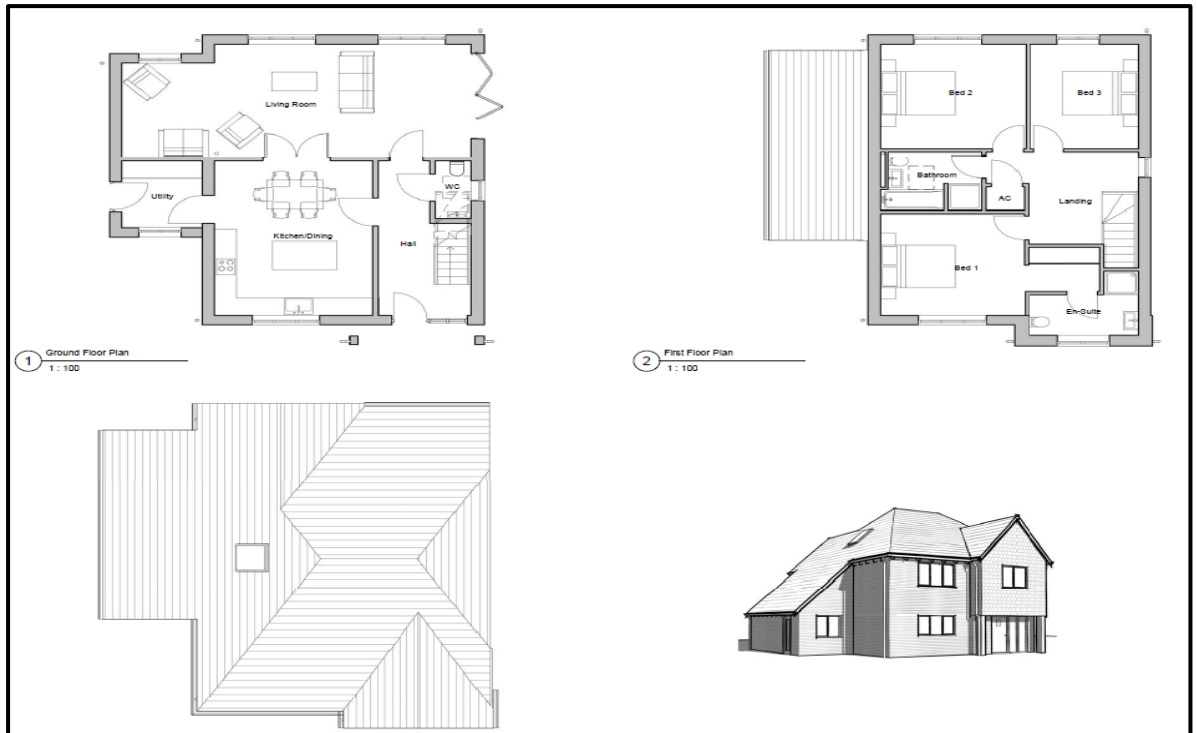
Typical house type Chichester 2 SX plot 9 proposed floor plans
